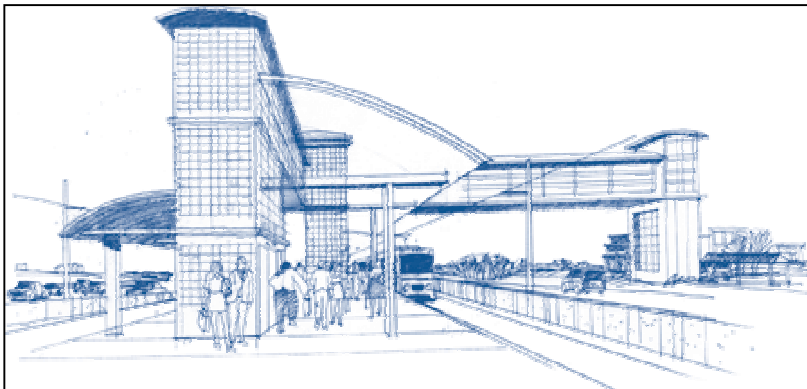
Artist's Sketch for Dayton Street Station, in the Median of I-25, Southeast Corridor Plan (Source: Carter Burgess)
